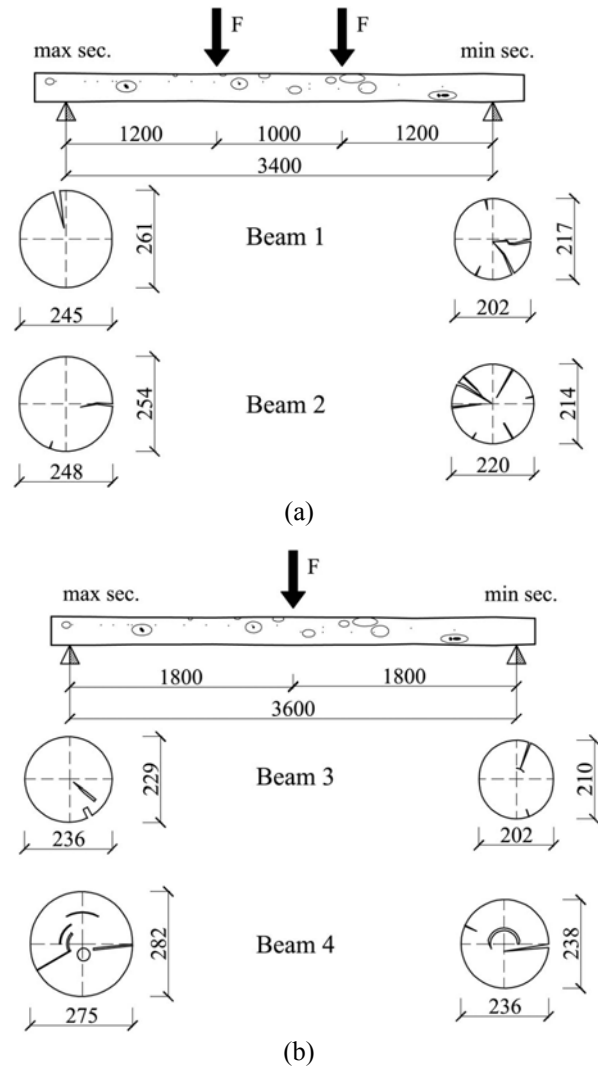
The loading scheme A (a) and B (b) used for beam testing.
